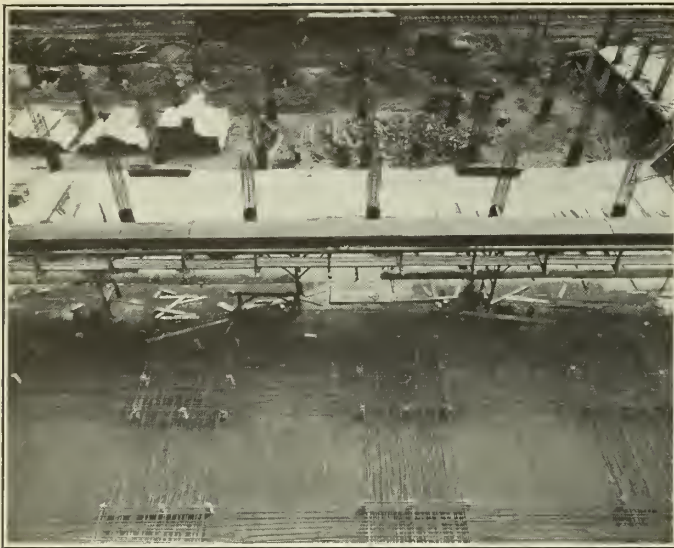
View Looking South from Station Building showing Belt Conveyor and Pre-moulded Concrete Blocks to Carry the "Four-way" Reinforcement in the Track Slab.
